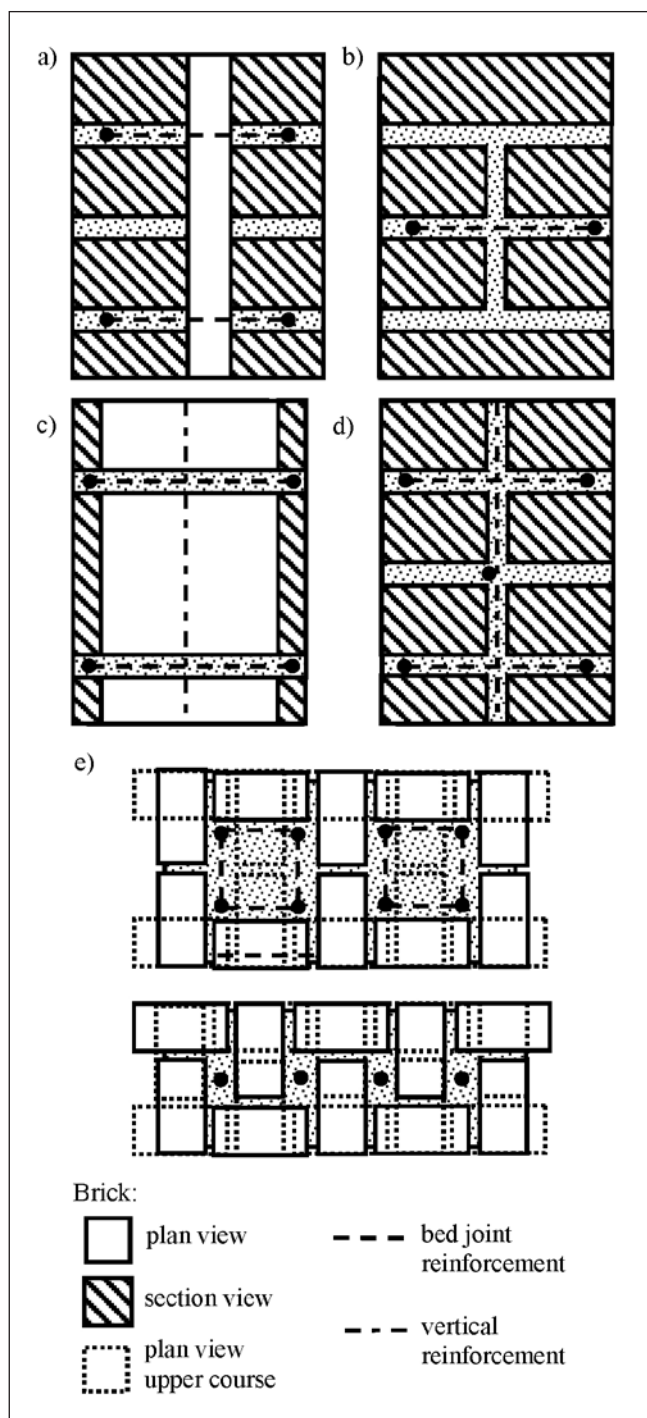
Construction types of the RM walls: a) Reinforced cavity wall, b) Reinforced solid masonry, c) Reinforced hollow unit masonry, d) Reinforced grouted masonry, e) Reinforced pocket type wall
